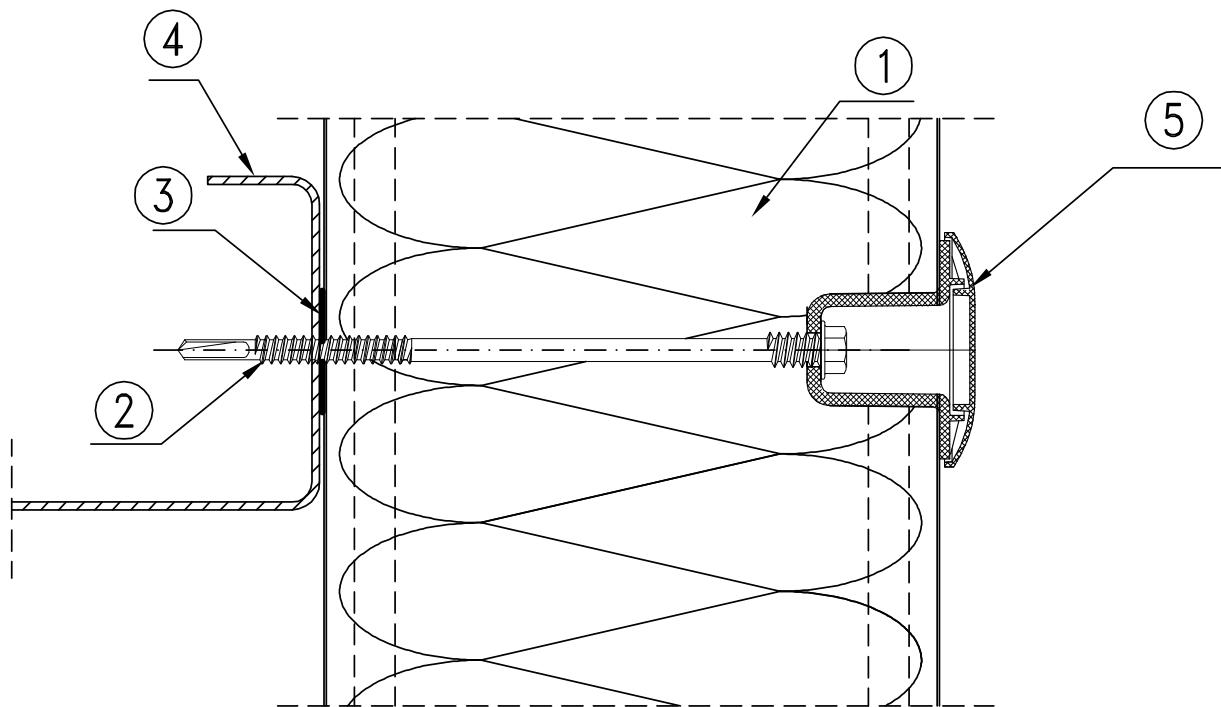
The fastening system for cold storage sandwich panels Balextherm-PU-F with the use of LAX anchors.
